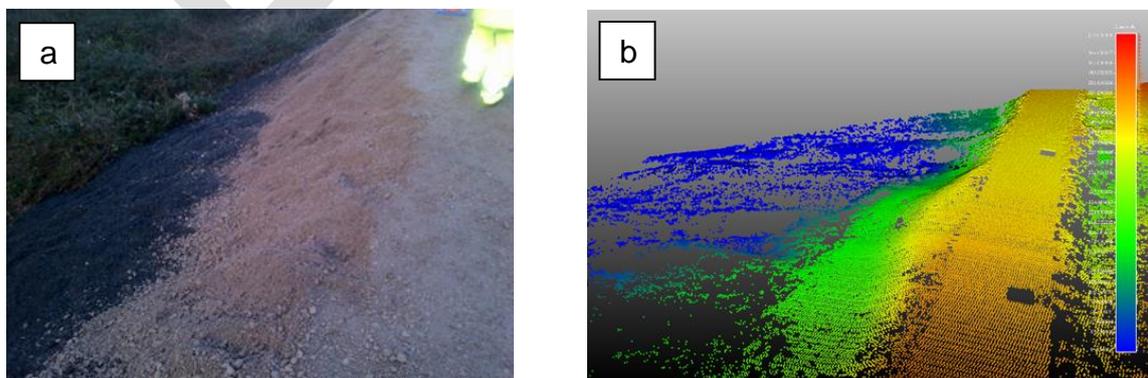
Photo of emergency slope support remedial works placed following failure (A21);
